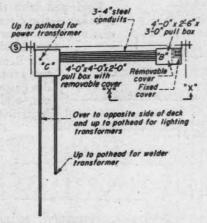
Conduits extend across ceiling under transformer deck to locations directly under transformer primary potheads. Separate conduits feed power, welding and lighting transformer banks.
